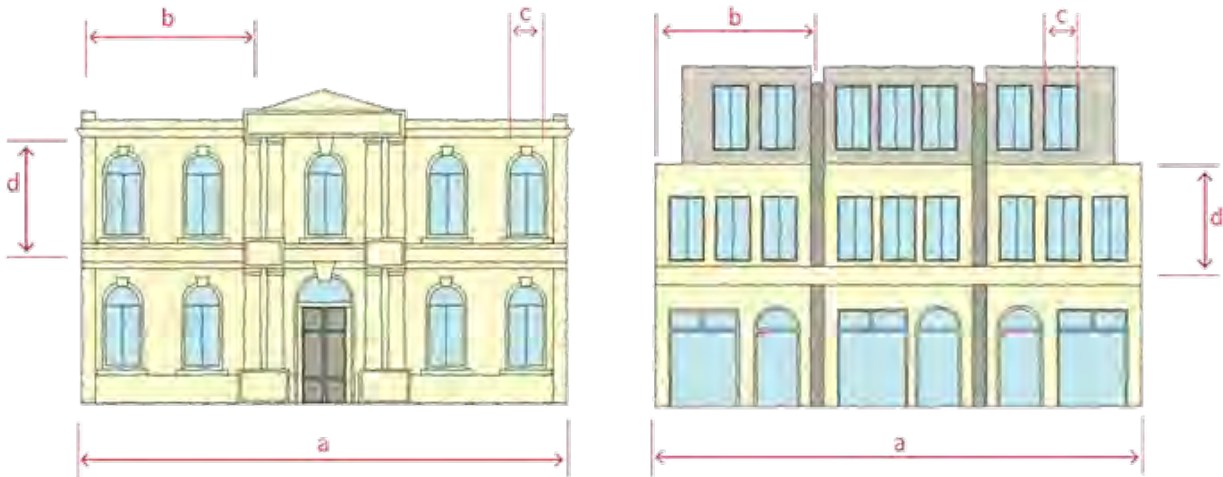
Take note of existing horizontal and vertical elements as part of a detailed site analysis. These features should be used to inform the elevational treatment of new buildings.
